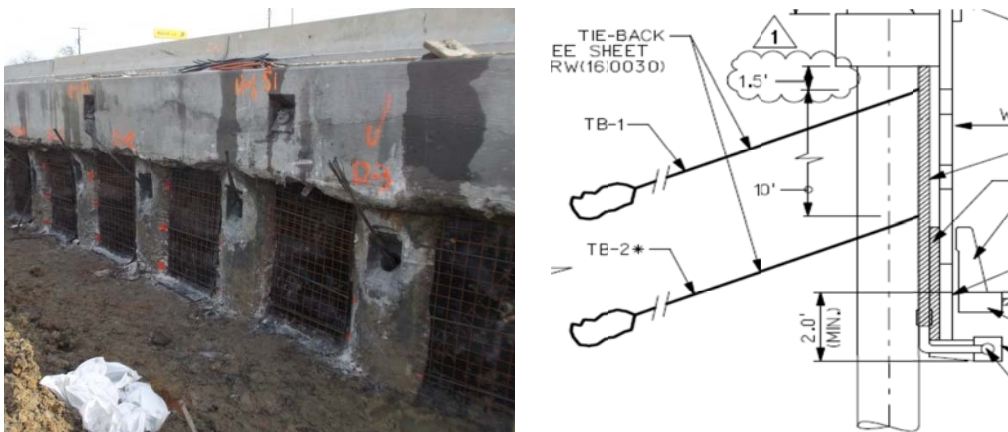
(a) Wall 3 drill shafts with tie backs and (b) typical section (personal archive 2014)
